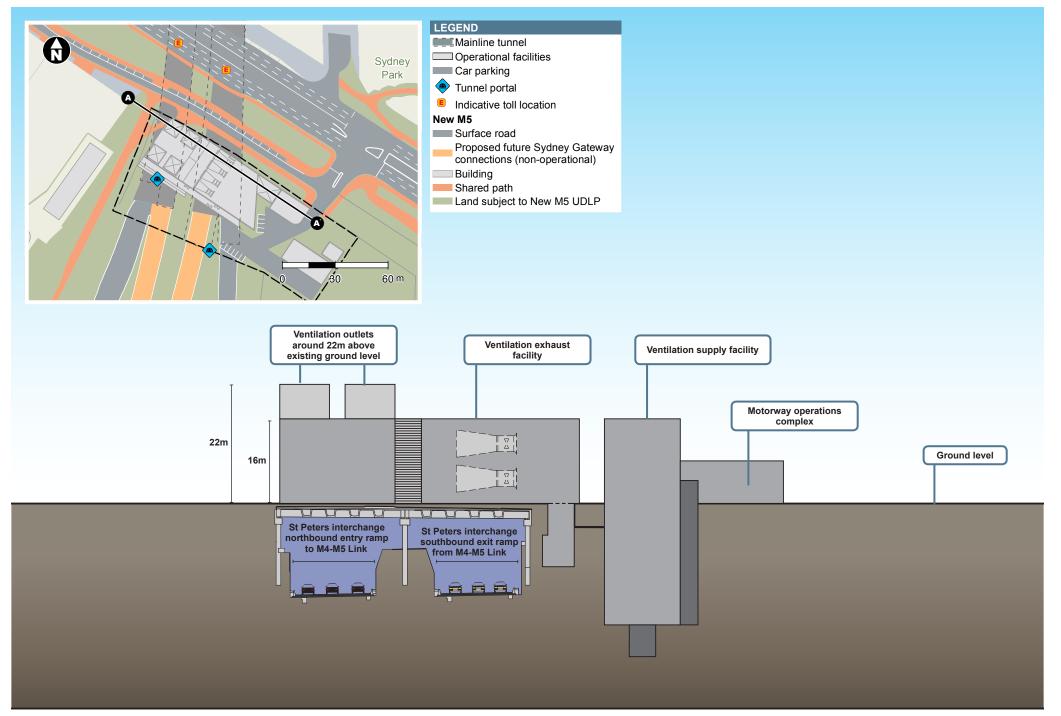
Indicative cross-section of the Campbell Road ventilation facility and outlets
